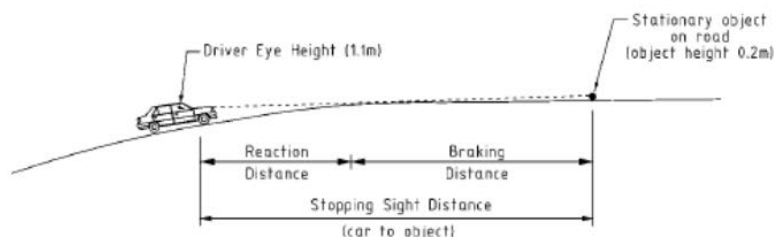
Extract Austroads Guide to Road Design Part 3 – 2021
